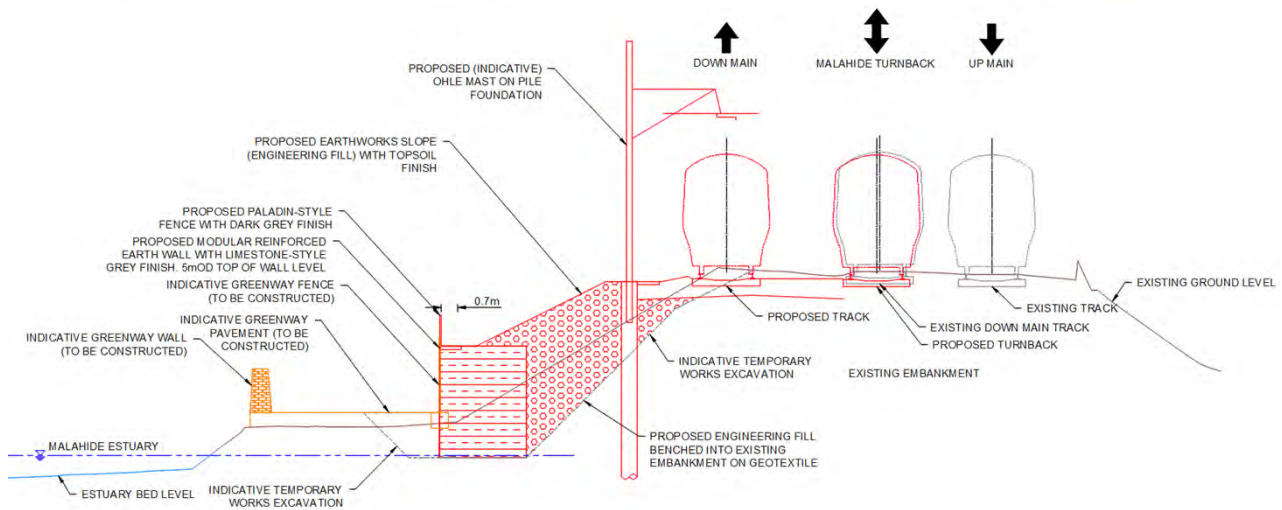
Typical Section of new Malahide Turnback Modular Reinforced Earth Wall
